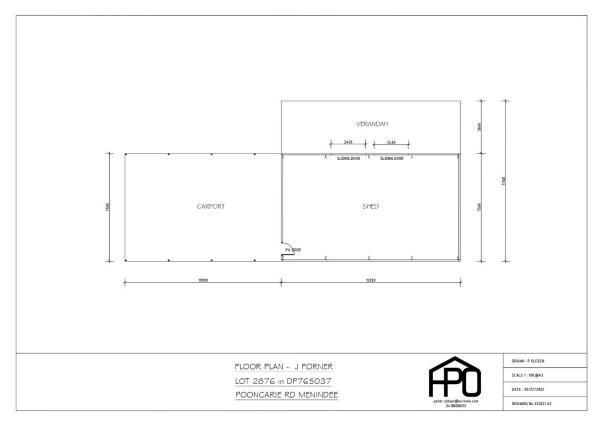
Proposed Floor Plan new shed & verandah J Forner Lot2876 in DP 765037 Pooncarie Road Menindee
